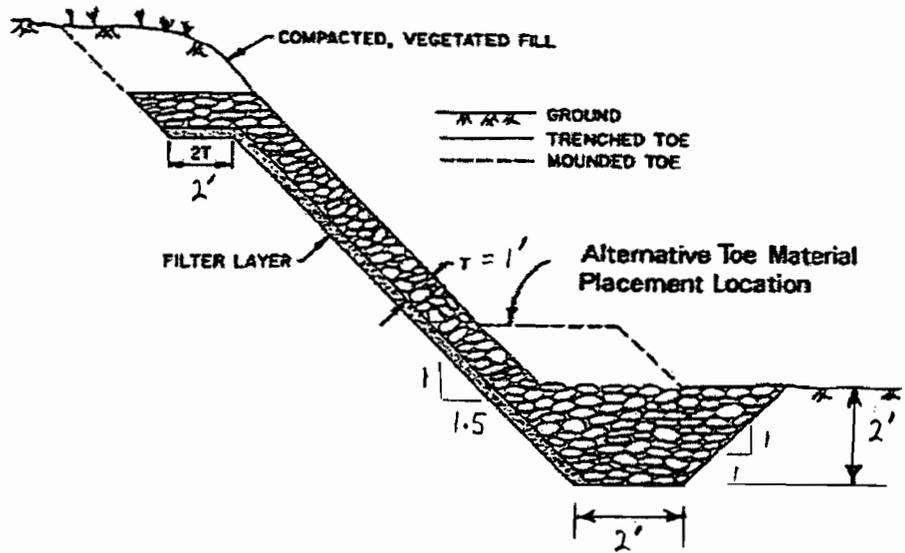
Typical Riprap Installation: End View (Bank Protection Only)
